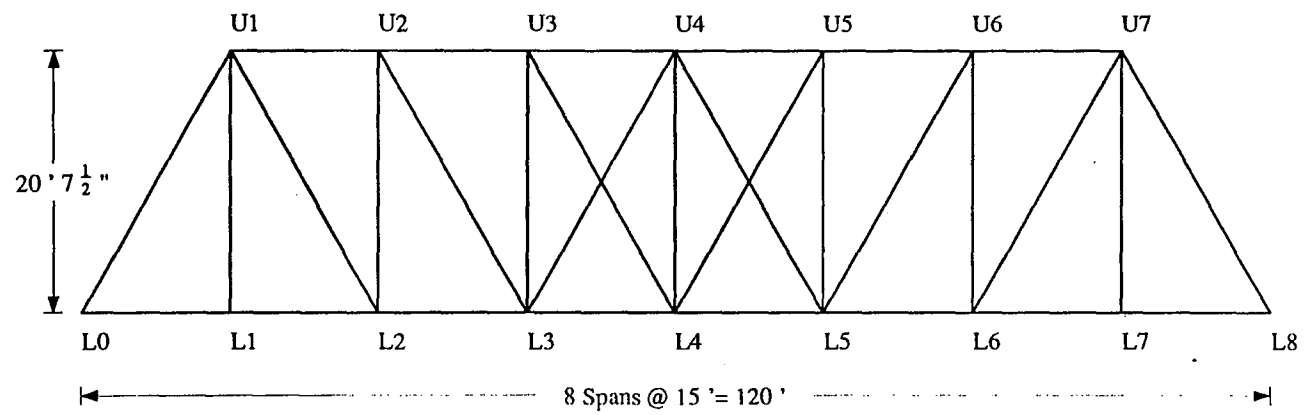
South Elevation of Cedar Bluff Bridge (068-10-19.9)
